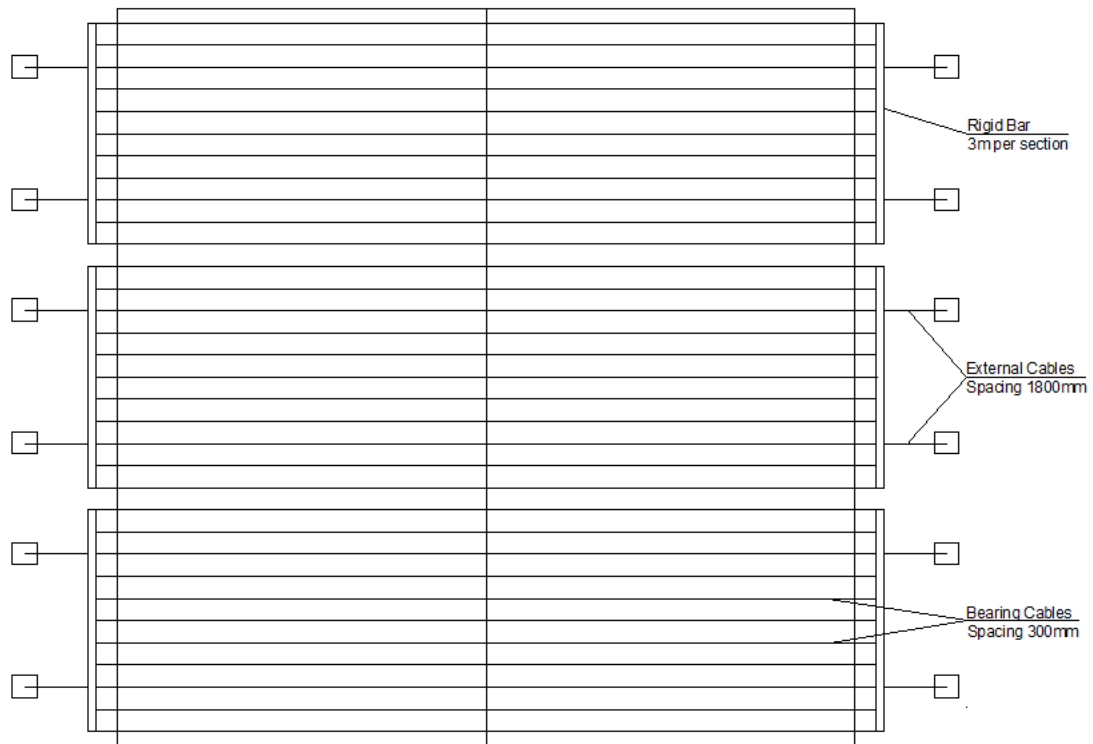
Plan view of proposed retrofit system as applied to a gable-style roof
